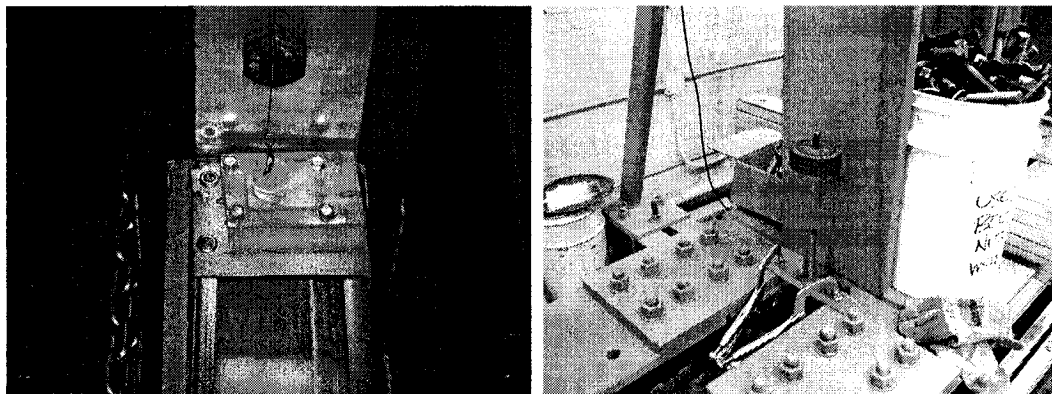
Steel wire attachment at top corner of wall (left) and attachment to LVDT at base of column (right)
